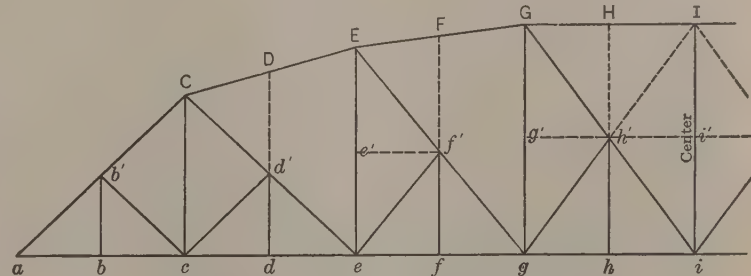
(c). Petit Truss or Pennsylvania Truss.
